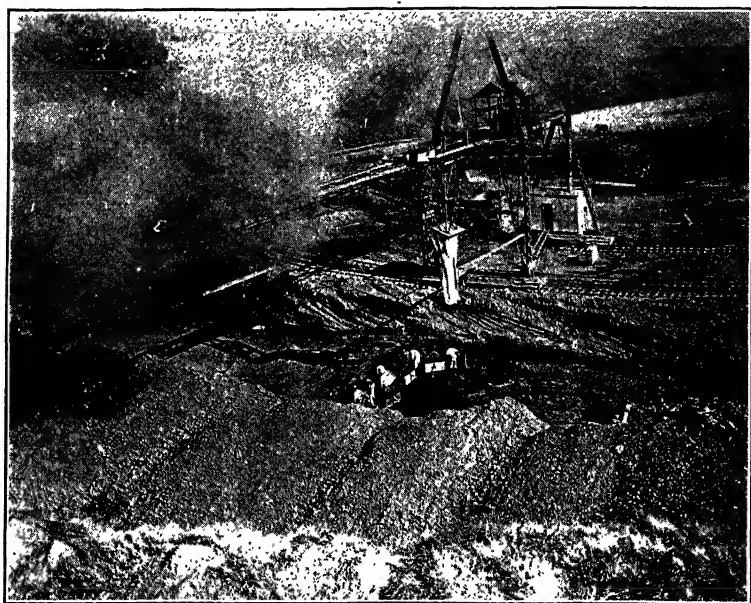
MINING WITH CANTILEVER, HOOVER & MASON MINE; OVERBURDEN IS PILED IN MINED-OUT AREA.
